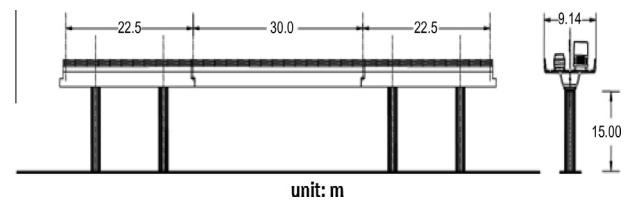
Gerber-type girders for the elevated viaducts in Mexico City.
